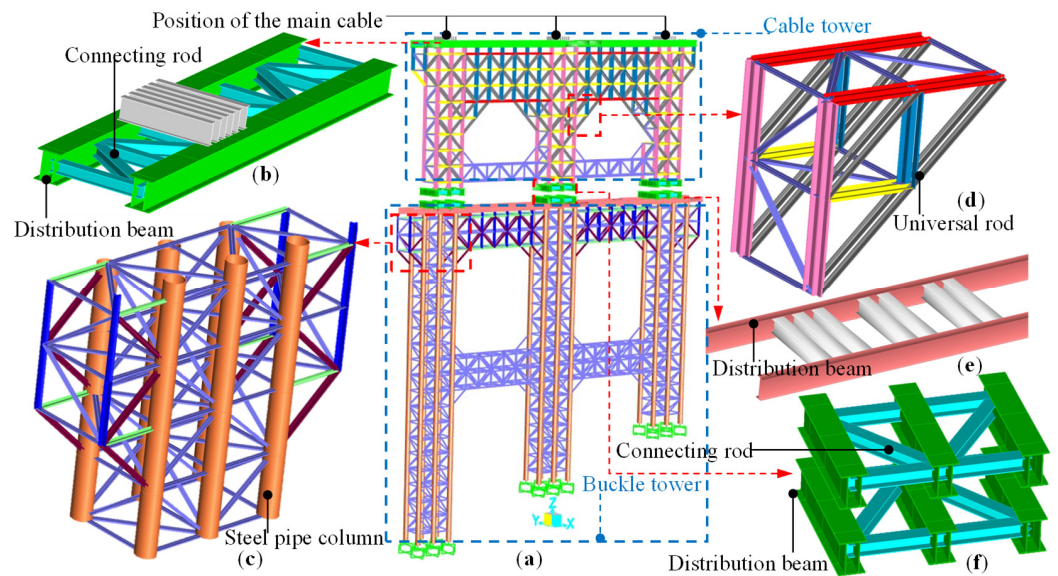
Numerical calculation model of tower: (a) tower; (b) distribution beam at top of cable tower; (c) steel pipe column and universal rods; (d) universal rods; (e) distribution beam at top of buckle tower; (f) hinge seat distribution beam.
